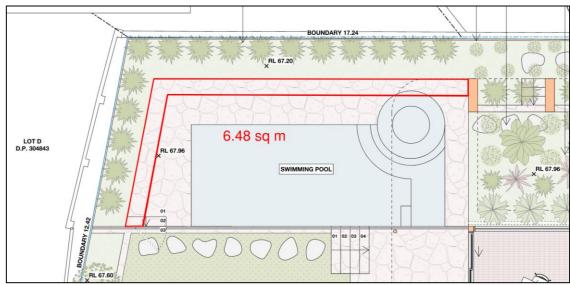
Landscape Plan detailing recommended increase to deep soil area.
